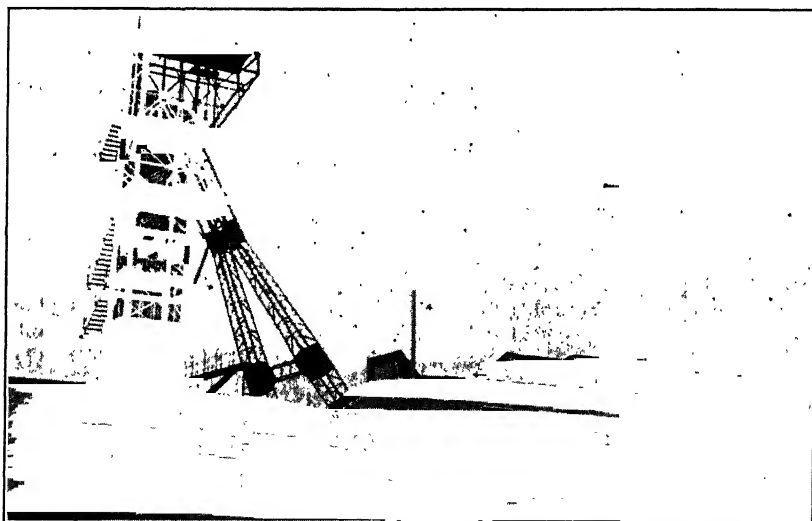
HEADFRAME AND SHAFT BUILDINGS AT CLEMENCEAU PIT.
